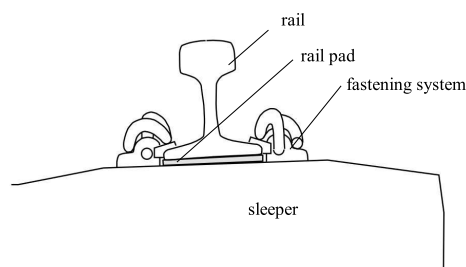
Connection between rail and sleeper (adapted from Dahlberg (2003)).
